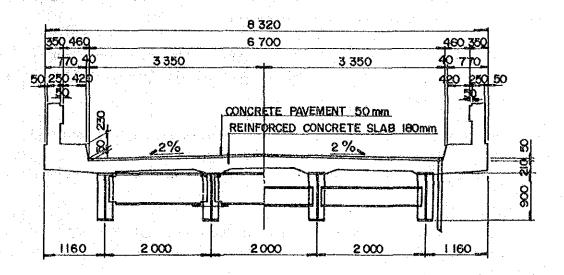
TYPICAL GENERAL VIEW OF BRIDGE
